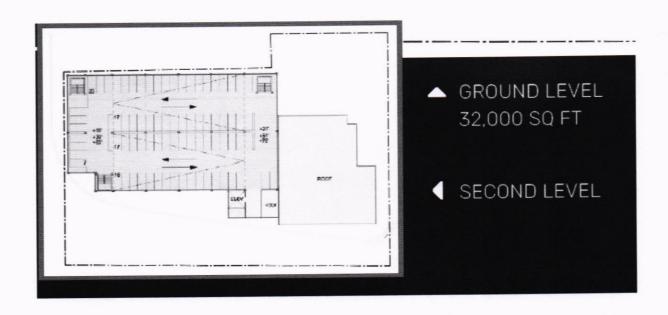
OF 2 OVERALL SITE PLAN
